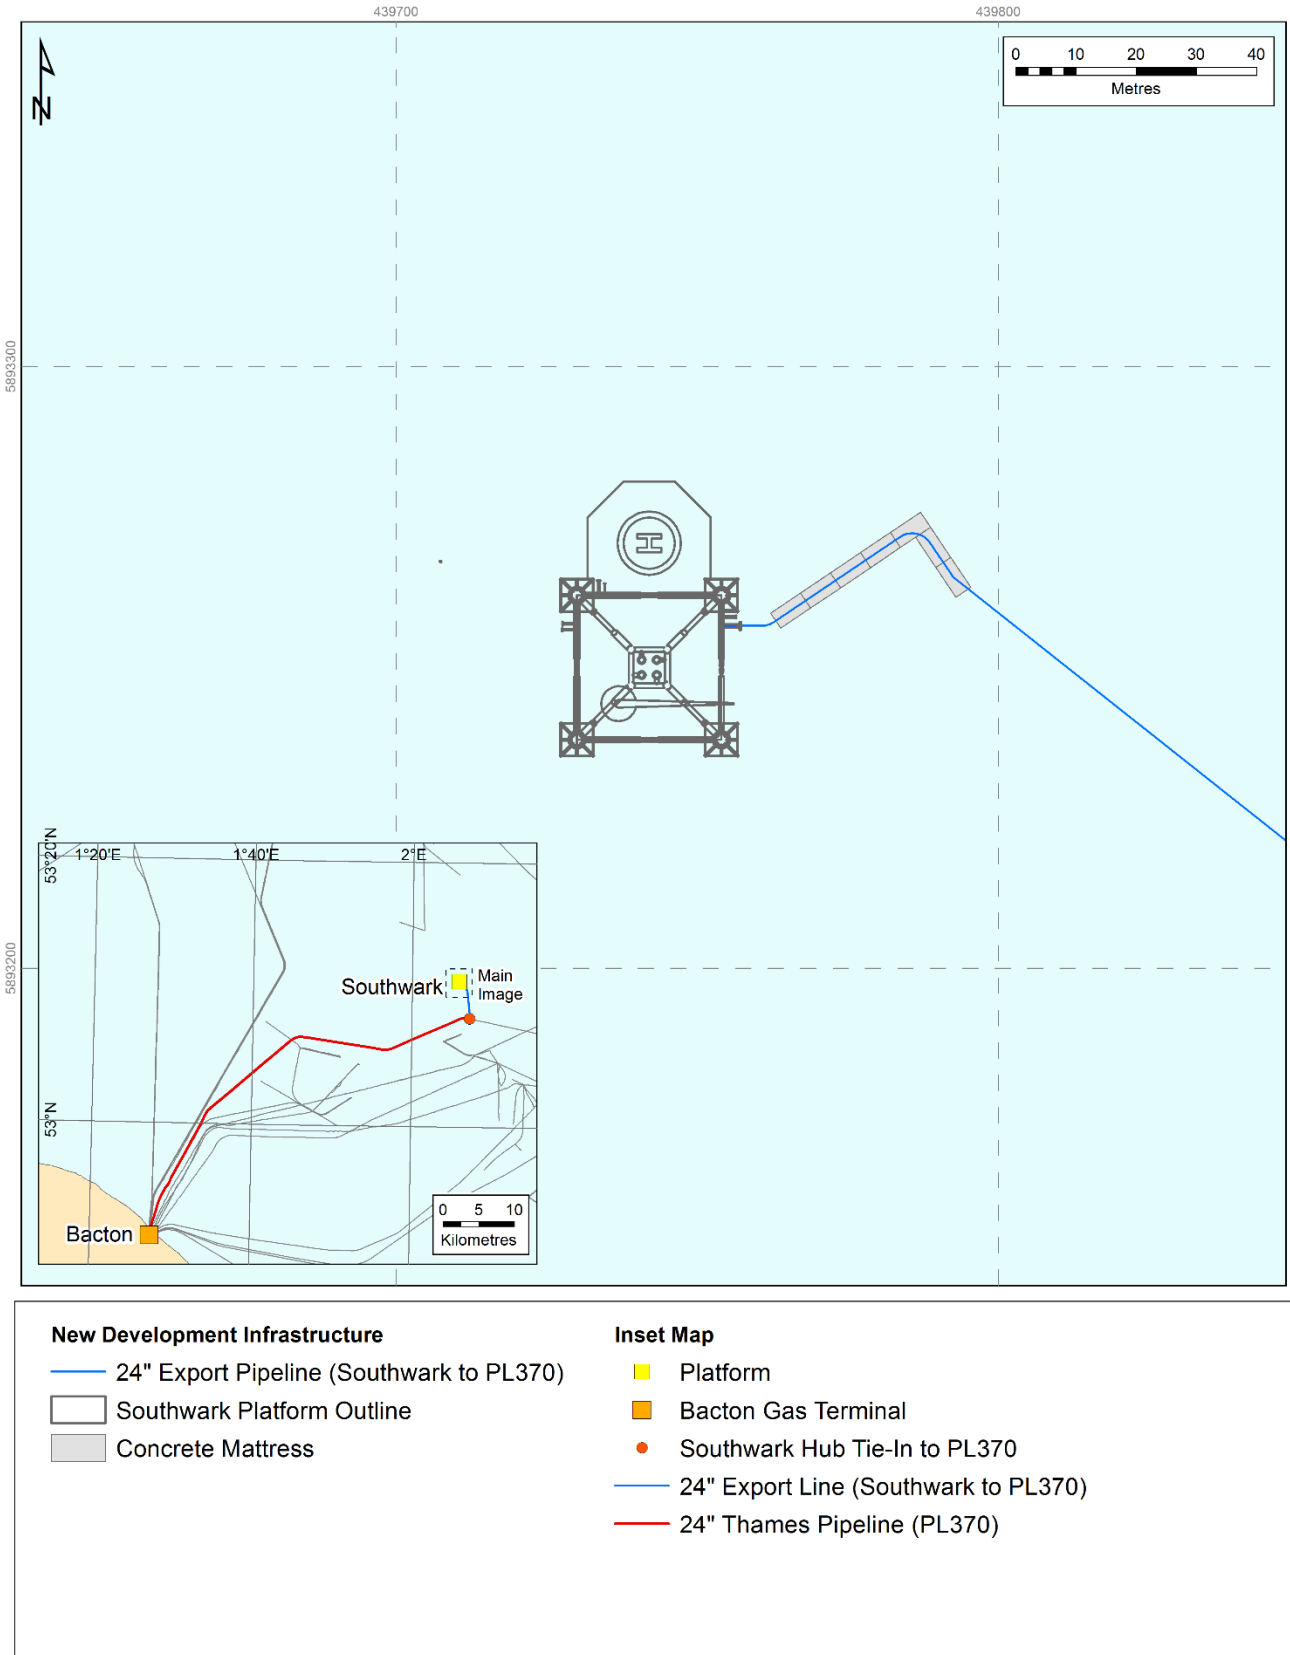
Pipeline Tie-in Protection Arrangements at Southwark
